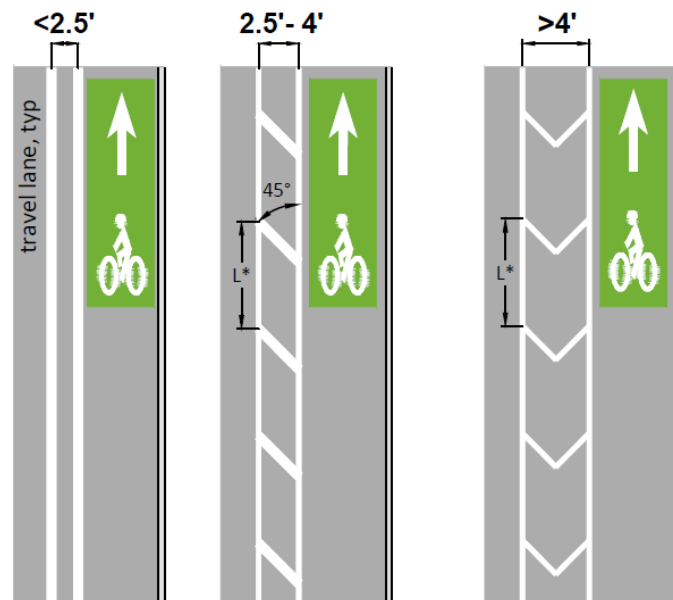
Typical Buffered Bike Cross-Sections
